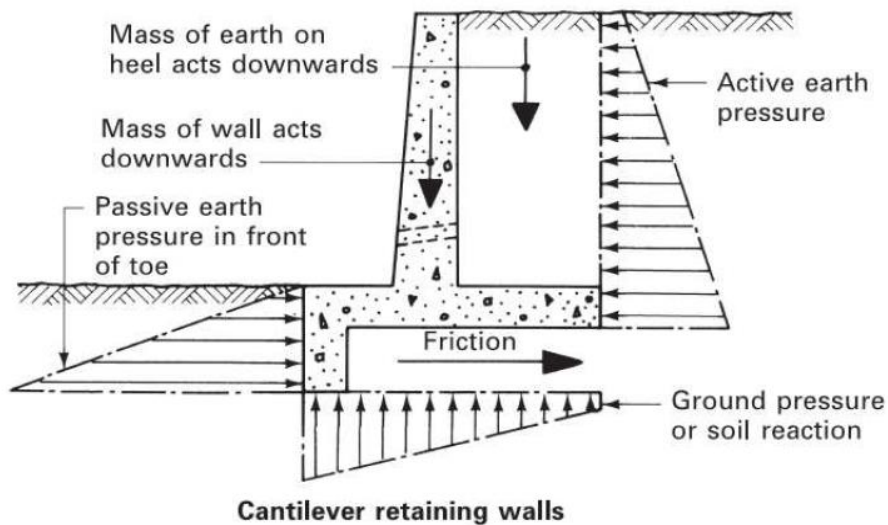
Cantilever retaining wall Earth Pressures [5].
